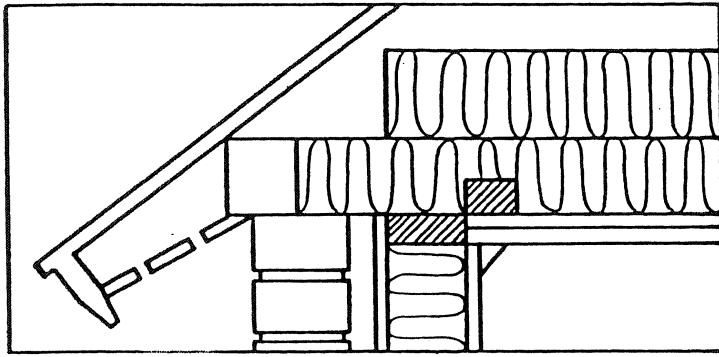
a A framed wall with a 95 mm mineral wool insulation according to the construction drawing. The ceiling is insulated with 200 mm mineral wool slabs. In the figure below is shown what often happens in practice.
